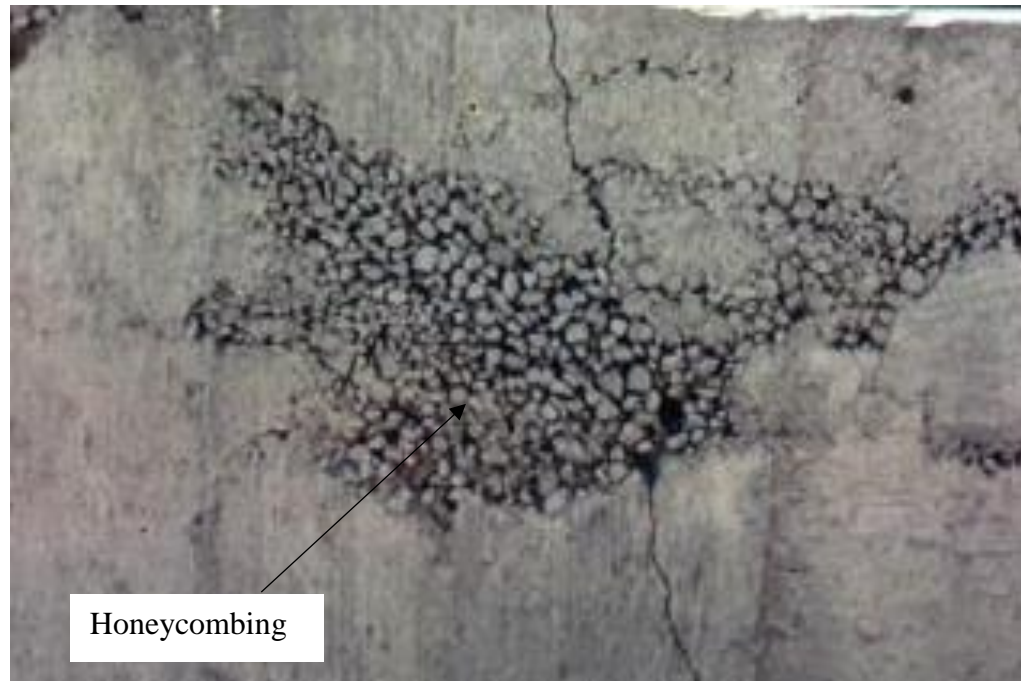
Bridge deck deterioration shows honeycombing [11].
